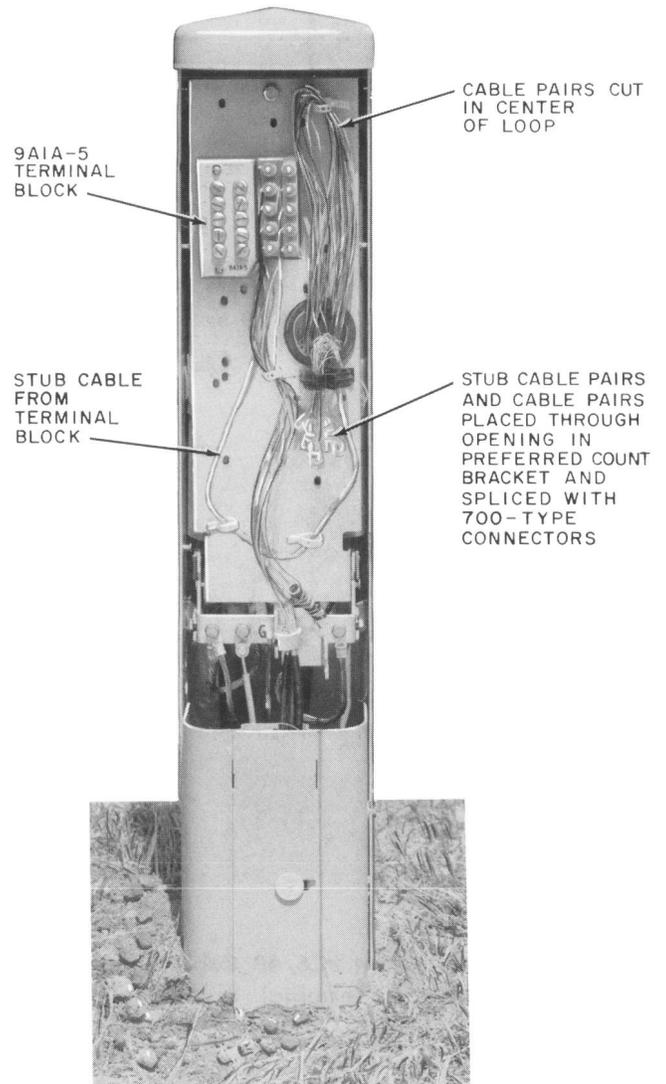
Preferred Count PC6/48 Cable Closure With Protected Terminal Block—Typical for PC12/55 Cable Closure
